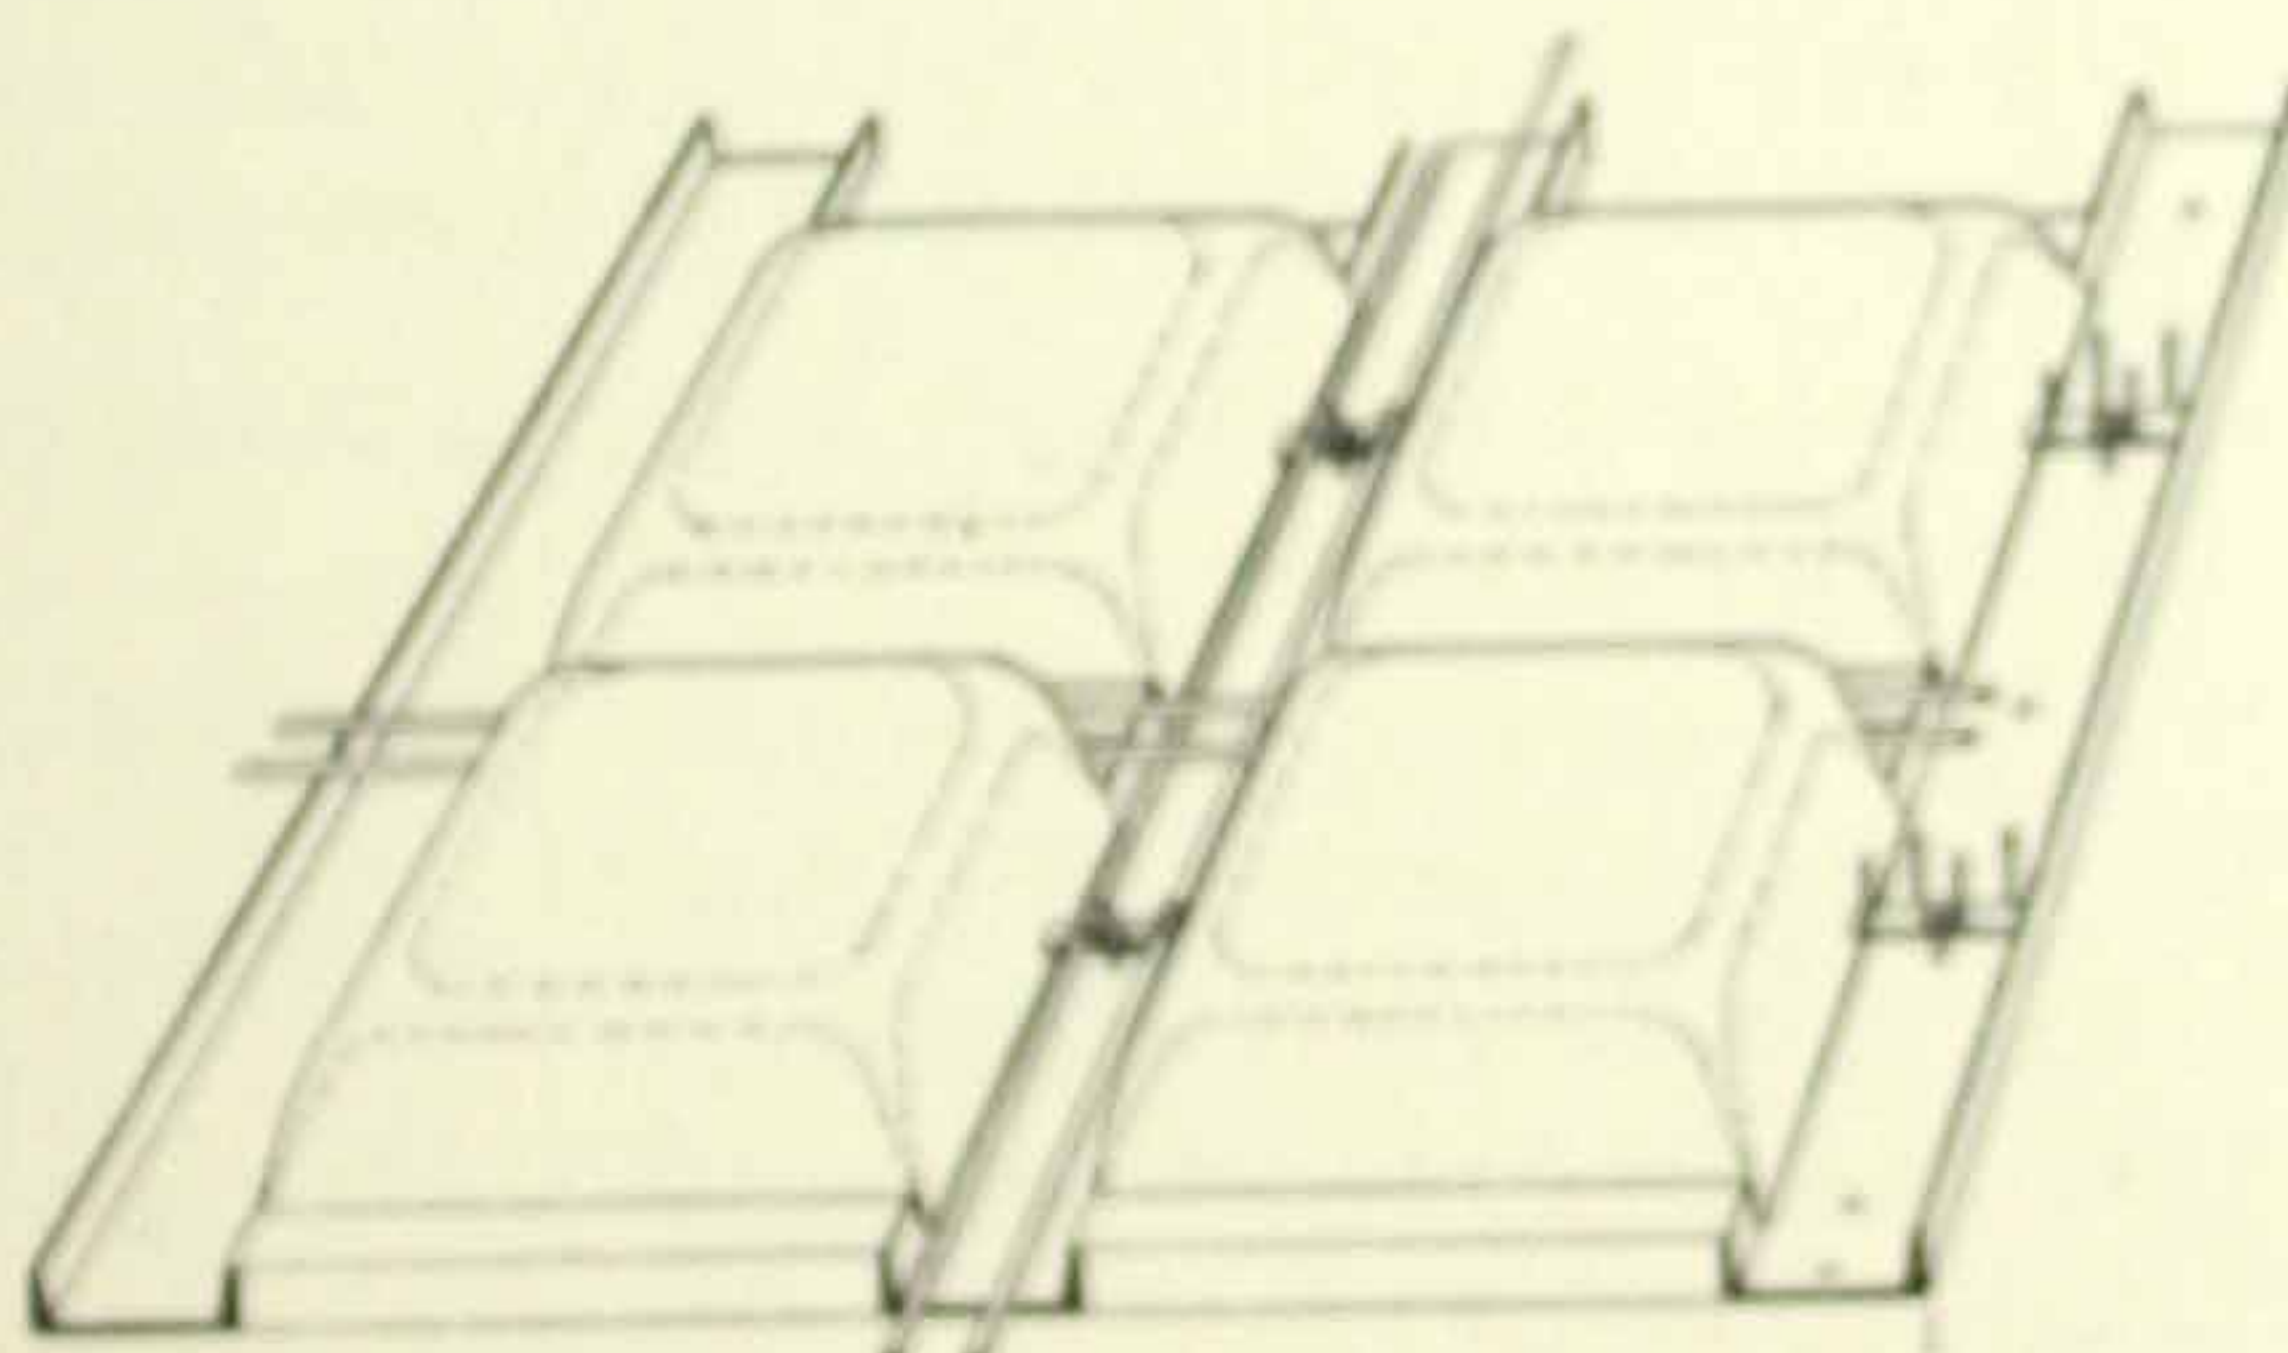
ASSEMBLY FOR RELIEVED SLAB CONSTRUCTION
